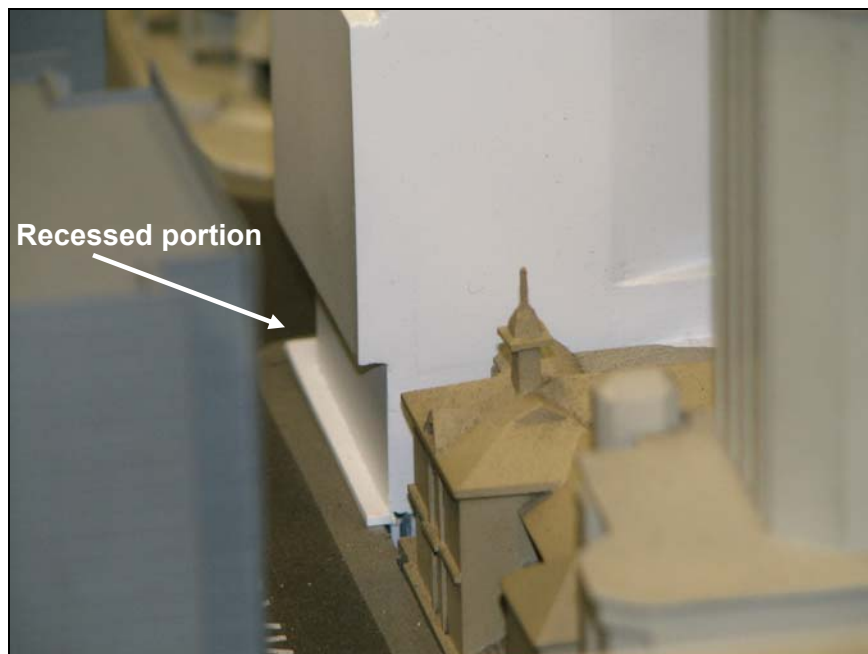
City model showing recessed facade of proposed Thomas Street elevation and relationship to adjacent heritage item to the west
